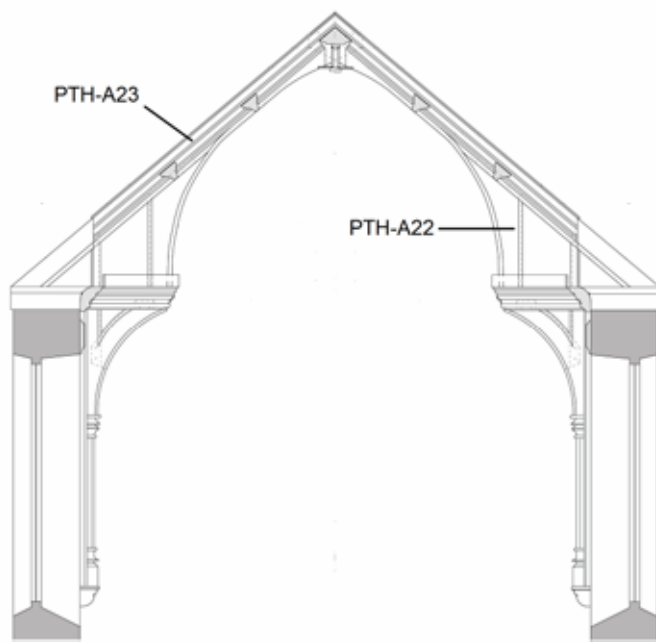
Nave roof, truss DE, showing the location of samples PTH-A22 and PTH-A23 (Nicholas Warns Architects Limited)
